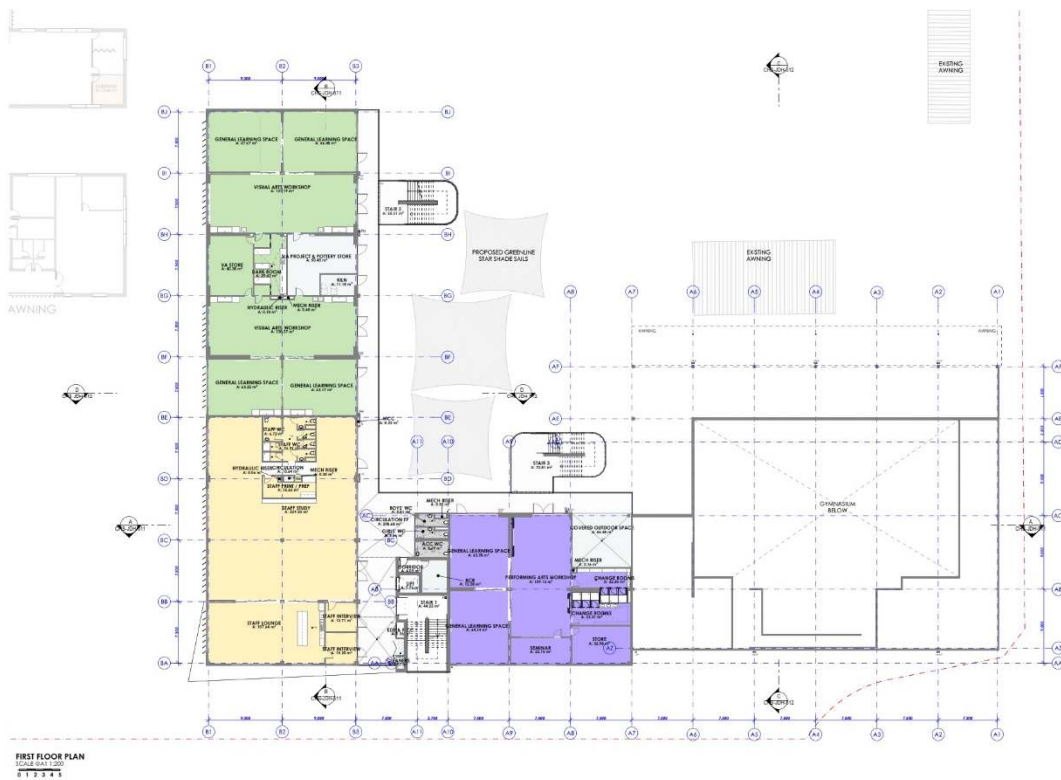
First floor plan. *Source:* JDC Architects 2023.
